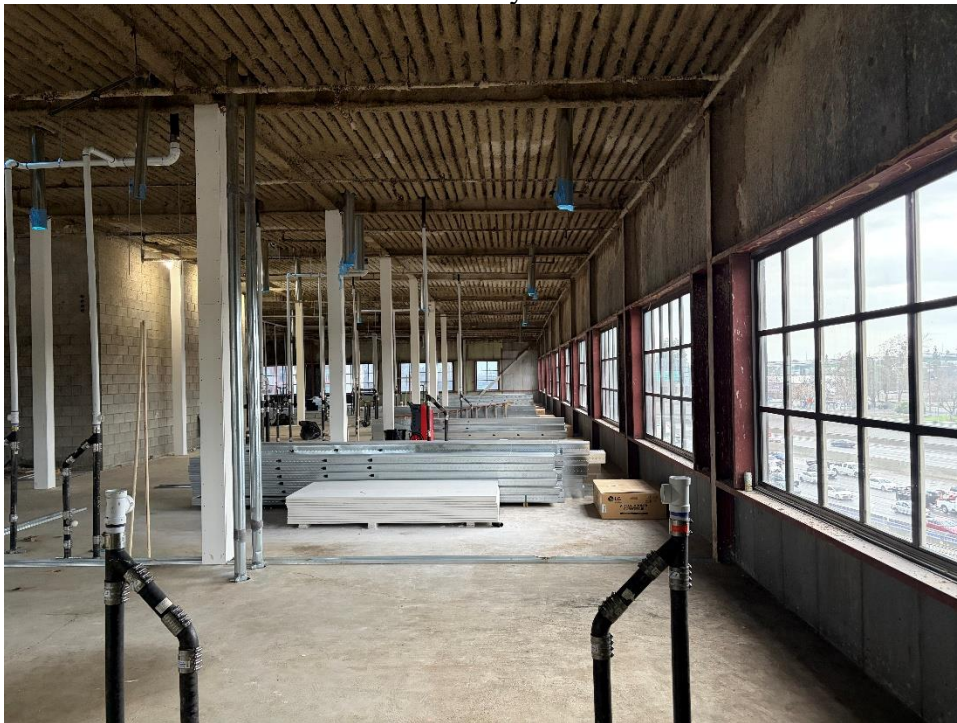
Fourth floor, 1947 addition, passenger elevator, view northwest.
